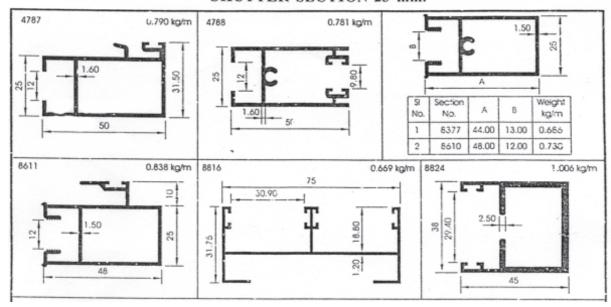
DETAILS OF SLIDING WINDOW SECTIONS SHUTTER SECTION-25 mm
